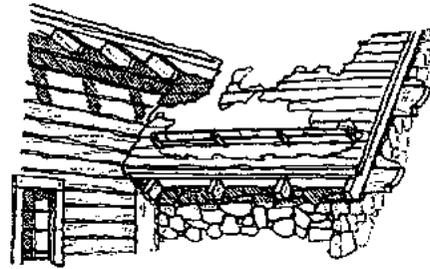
Building eaves should express exposed structure at rafters and outriggers.
